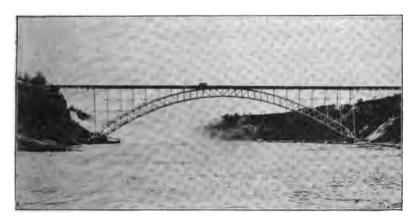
CLARITON-CLIFTON TWO-HINGED ARCH HIGHWAY BRIDGE OVER NIAGARA RIVER.
